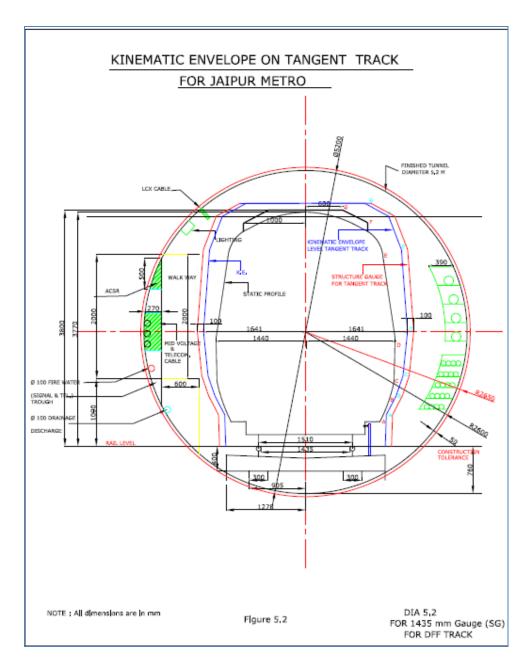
Typical Cross-Section of Tunnel (DPR, 2011)
